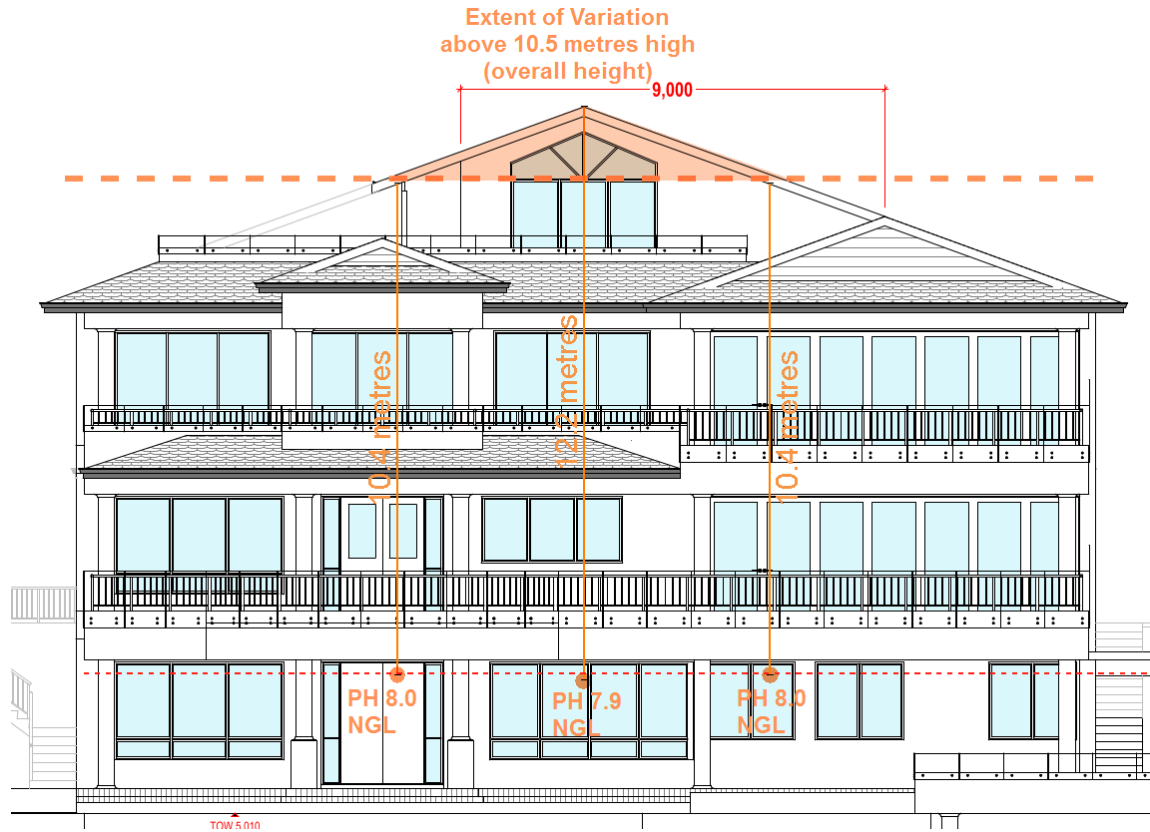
Elevation plan of the subject dwelling identifying the portion of dwelling exceeding the overall 10.5 metre building height.
